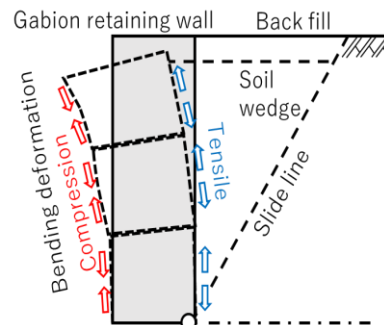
Schematic diagram of gabion-based retaining wall deformation
